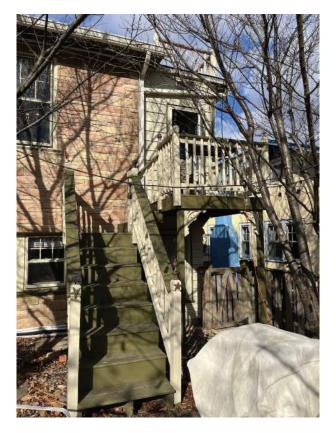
WALNUT AVE. NORTH-WESTERN CORNER
